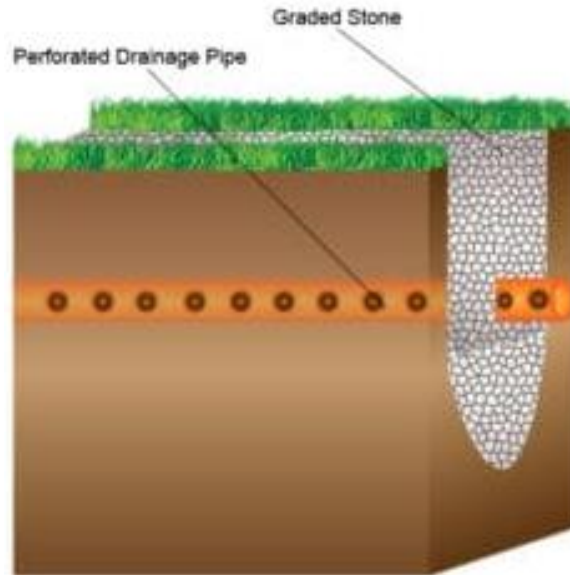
Example of simple French drainage to be used on the side of the main roads
